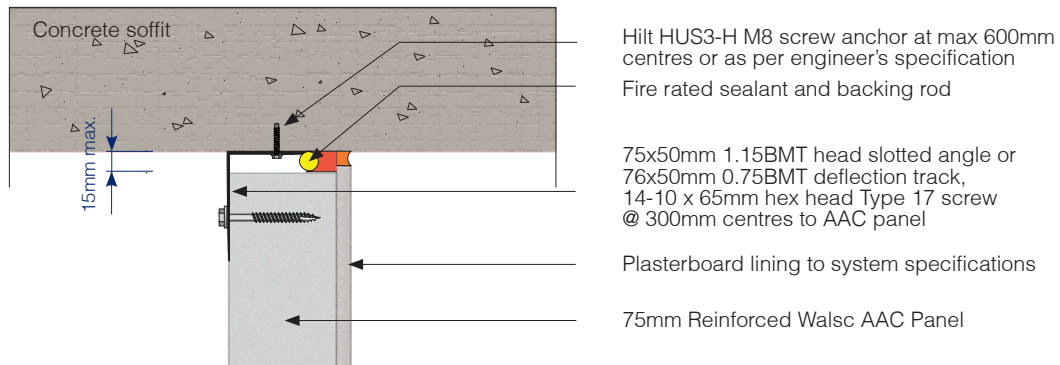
Service Shaft Wall Option 1 Top Fixing Detail
